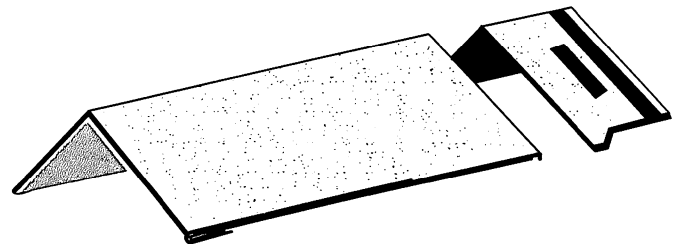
Cutting an EZ-Ridge™ Shingle to Make a Hip and Ridge Starter Shingle
